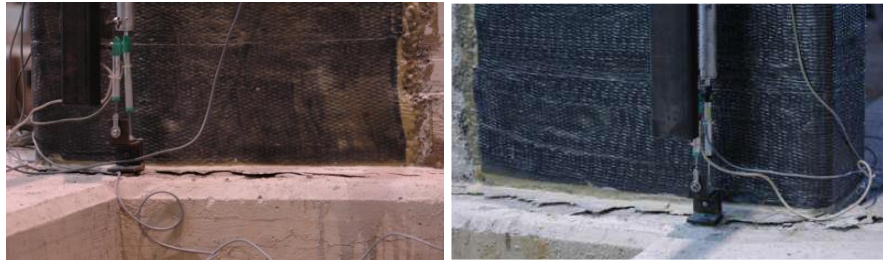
Crack that opened on the ground beam of the foundation on the base of the south wall in both sides (Poljansek *et al.*, 2014)
